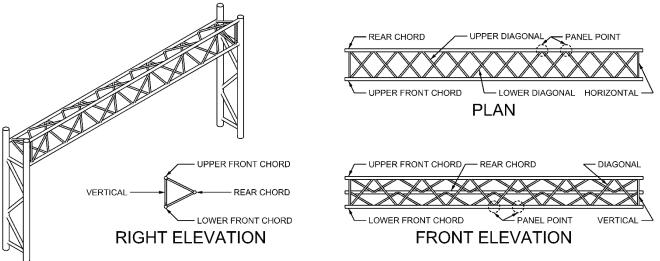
Overhead Span Traffic Signal Structure, Tri-Chord Space Truss
